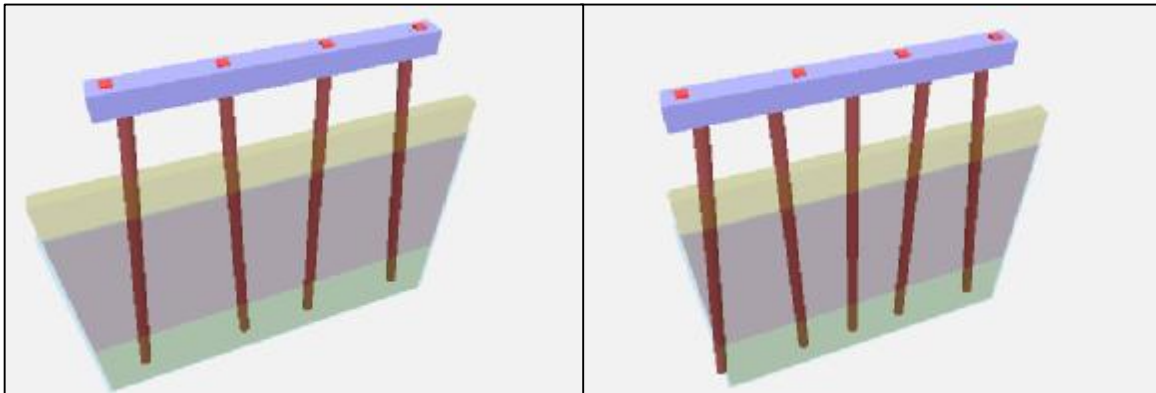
Northampton Bridge Models—Four and Five Pile Bent. Note location of bearing pads
